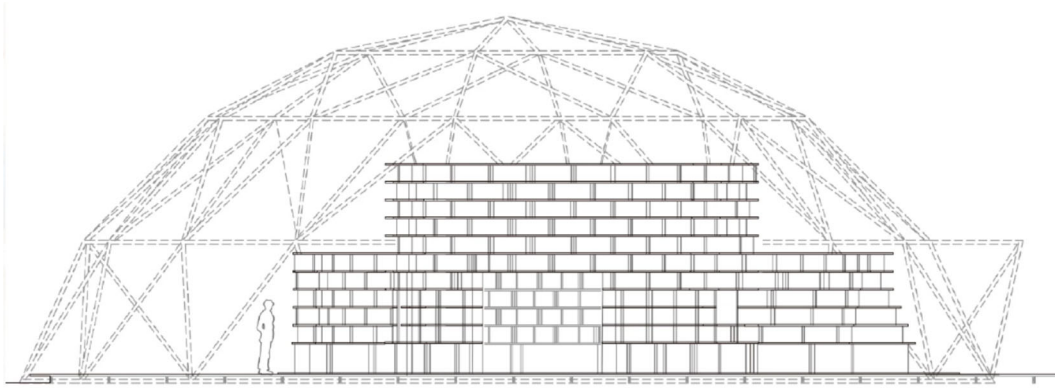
Elevation of the Camper Pop-up Shop in the dome
